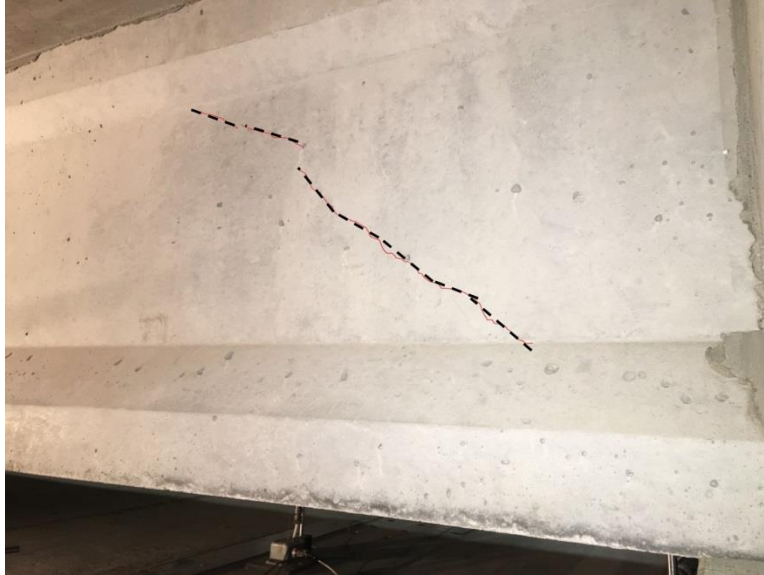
Initial web shear crack in the loaded girder (highlighted with a red and black dashed line)
